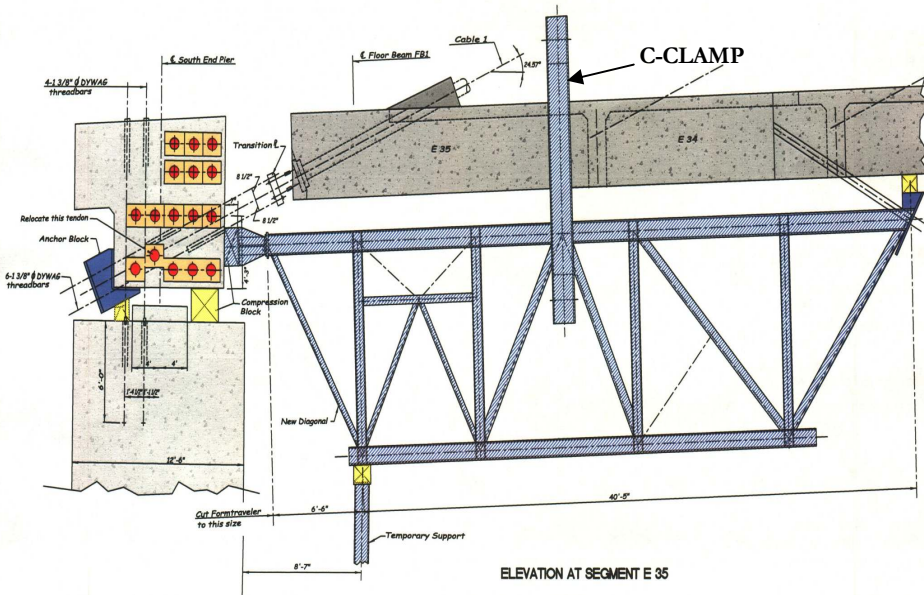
SIDE-SPANS FIXED TO ABUTMENT PIERS WITH MODIFIED F-T TRUSS AND TEMPORARY SUPPORT.
